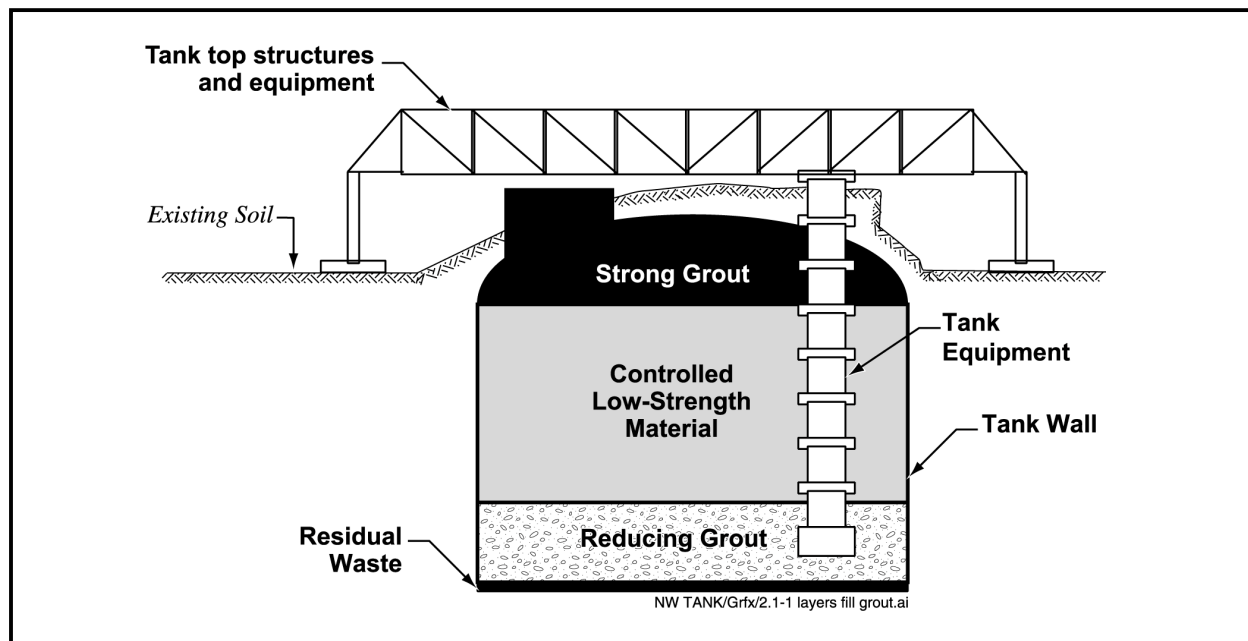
Typical layers of the Fill with Grout Option.
